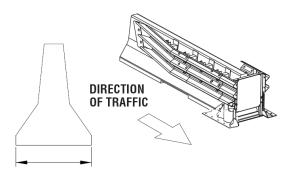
Thrie-Beam to Safety Barrier Connection Panel
